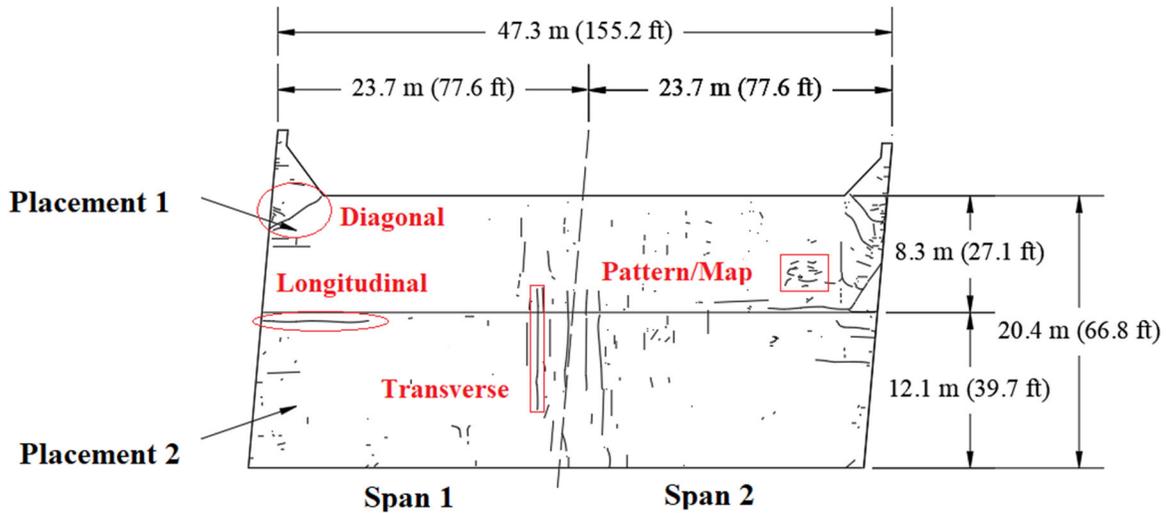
Major Bridge Deck Crack Types as shown on a crack map: Transverse, Longitudinal, Diagonal, and Map/Random Cracking (Darwin et al. 2016)
